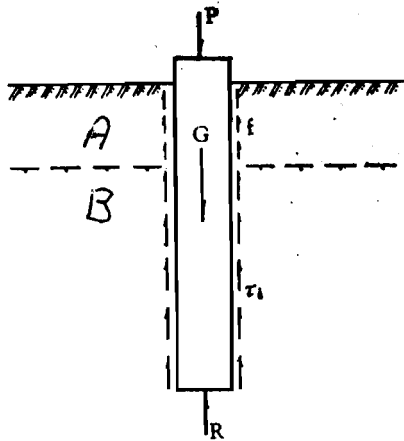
Load carrying potential exerted upon foundation by freezing potential
